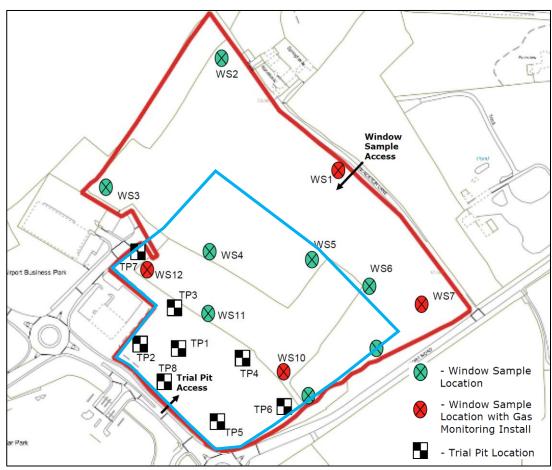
Site investigation layout plan. The approximate application site boundary is shown in blue.
